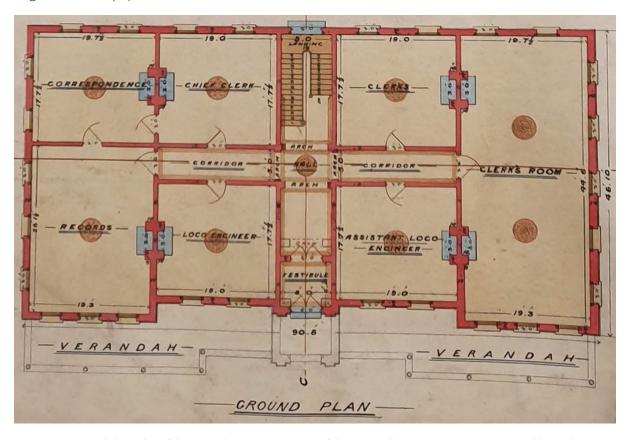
Ground Floor plan of the original 1887 construction of the CME Building. Source: Rappaport & Caldis Cook Group, 1997.
